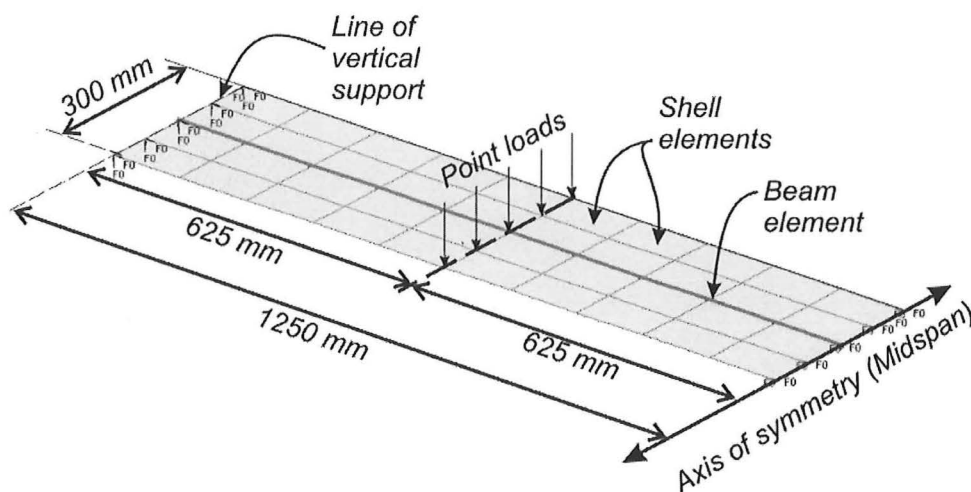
Discretisation of the Hibond slab cross section with the shell and beam elements.
